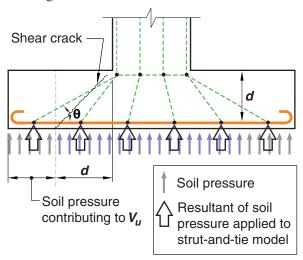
One-way shear design of a spread footing using the strut-and-tie method.
